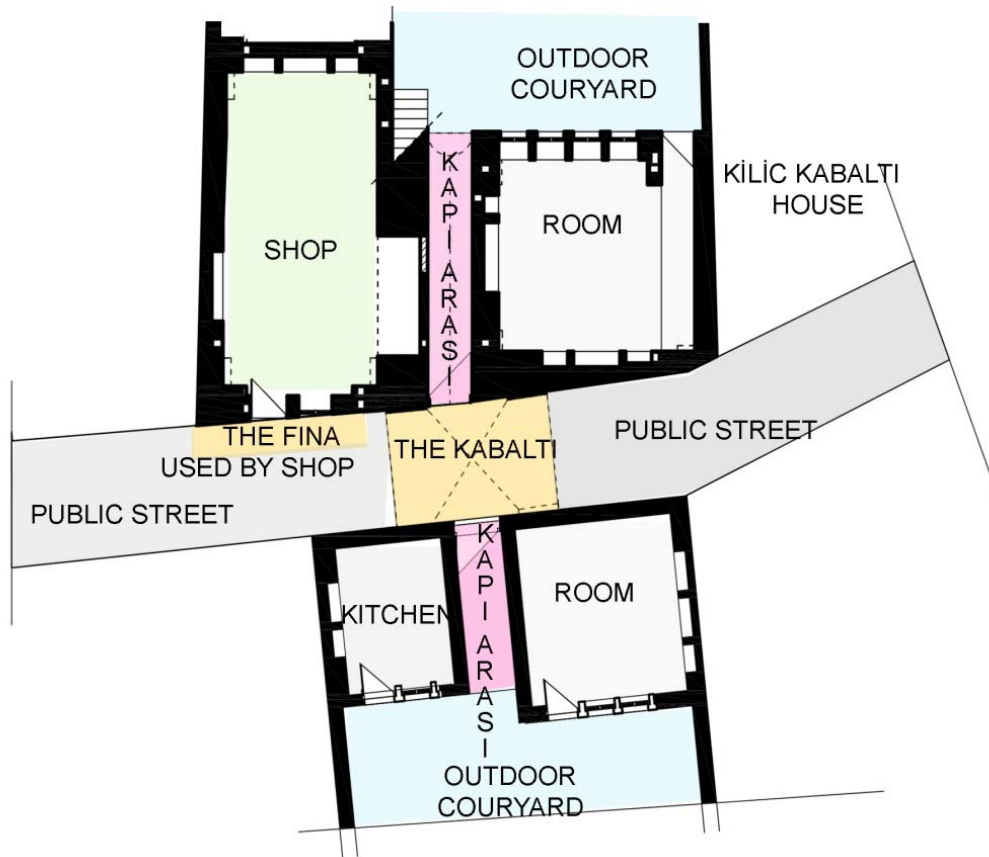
Zoning of the ground floor plan of Kilic Kabalti House
